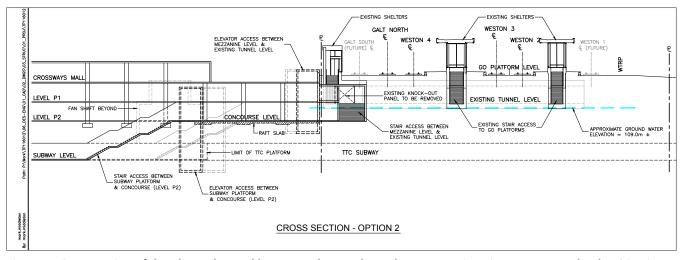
Cross section of the planned tunnel between Bloor and Dundas West stations (Amec Foster Wheeler, 2016)
